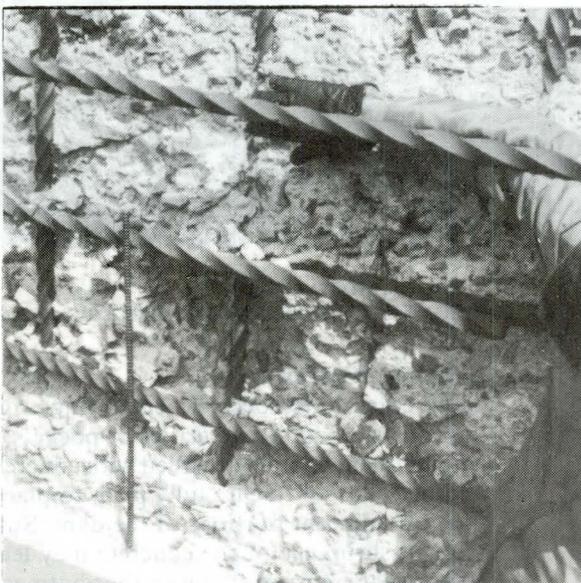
STRUCTURAL DAMAGE. Spalling has exposed reinforcing.
